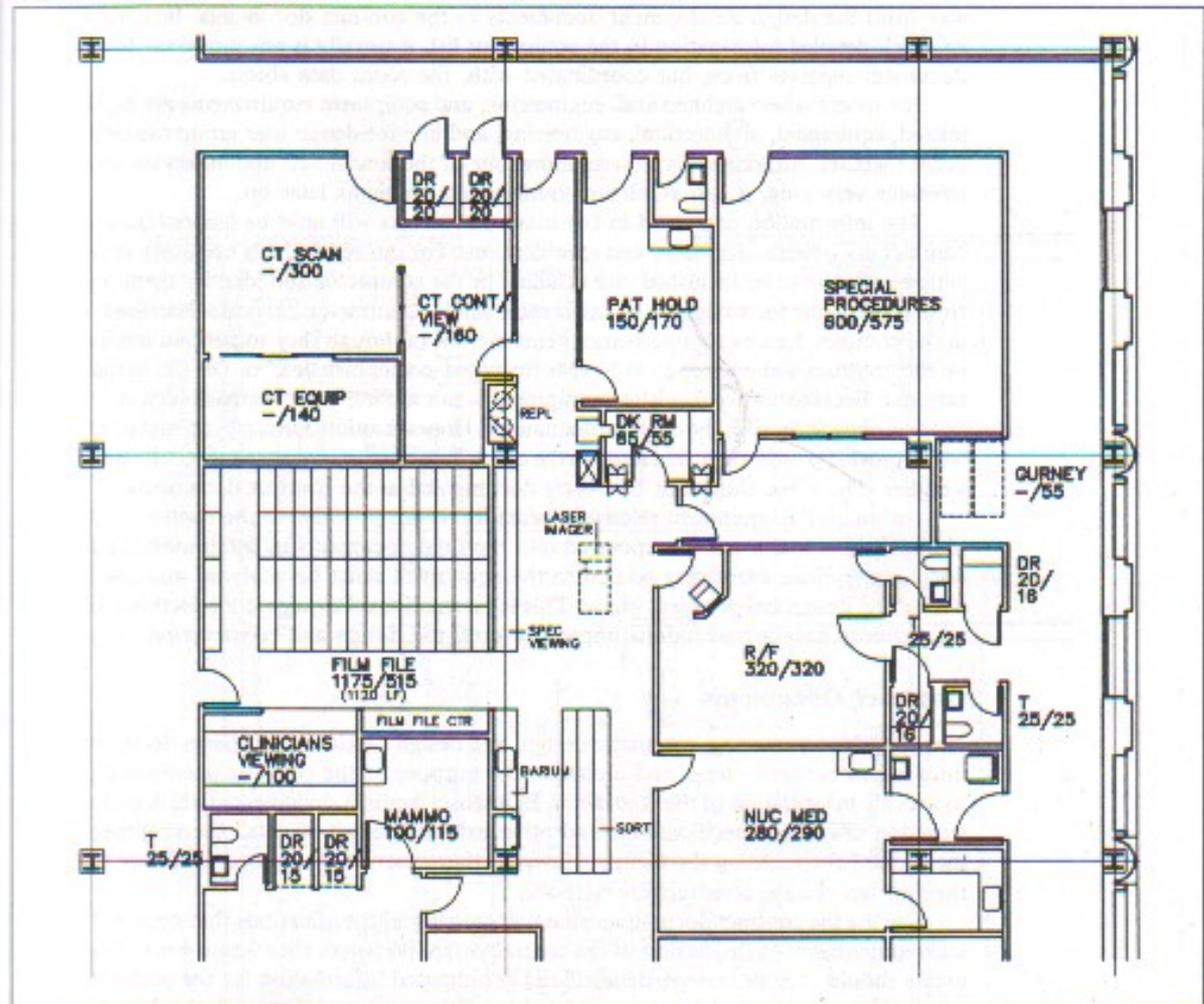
Example of a Single-Line Schematic Departmental Layout
